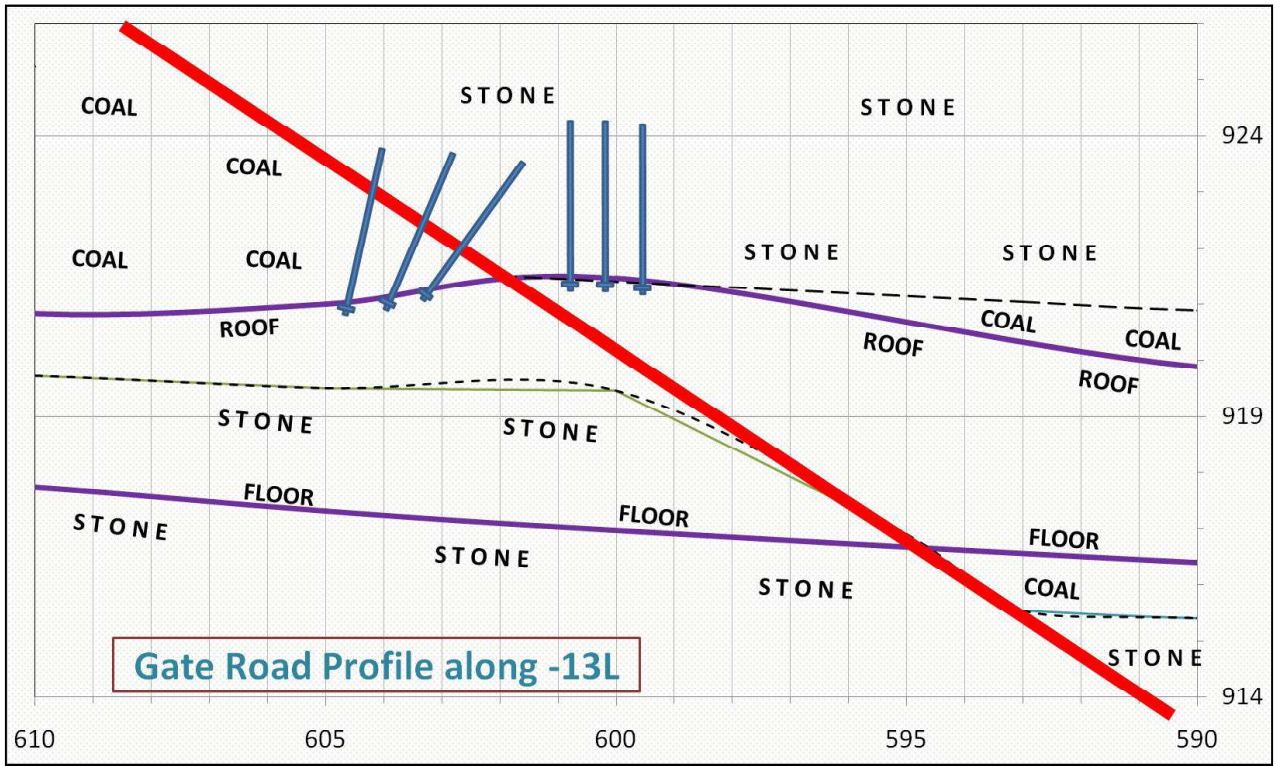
Bolting reinforcement scheme in main (bottom) gate, -13L
